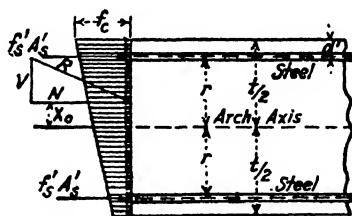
Stresses caused by a force producing compression upon the whole reinforced section.
